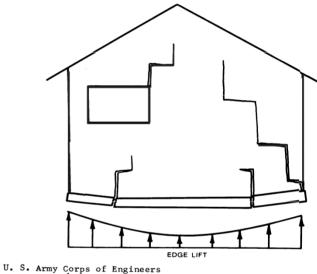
Examples of fractures from dish-shaped lift on swelling foundation soils.
